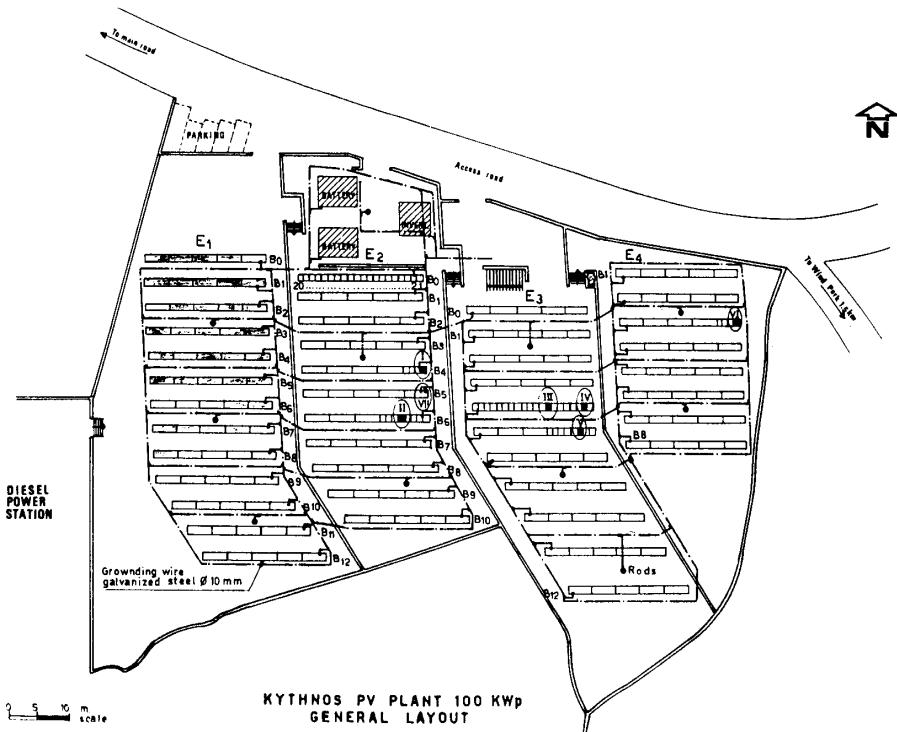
Location of ground cables, air terminals, and modules presumed damaged by lightning
